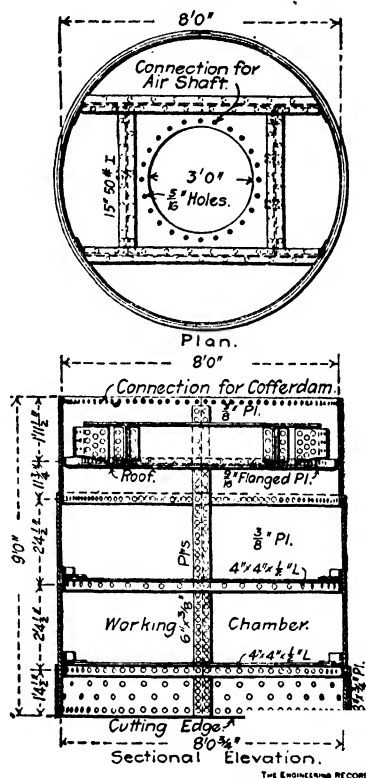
Caisson for Inside Column. Foundation, Mutual Life Building, New York.
